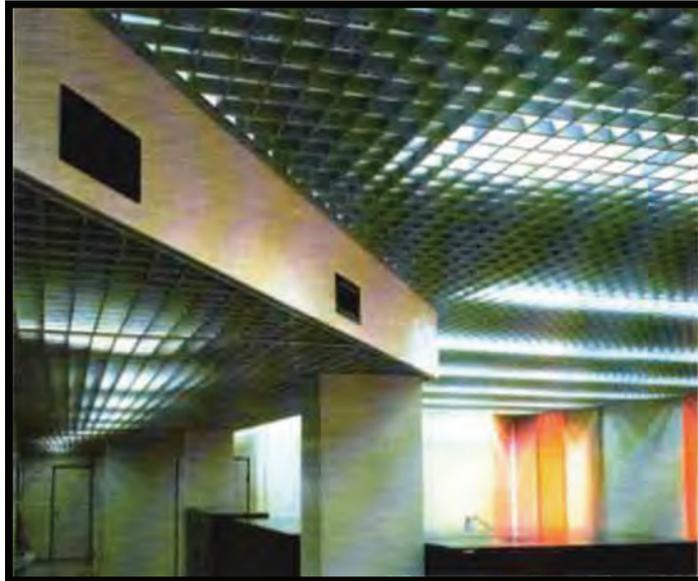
Discontinuous bar-type grating ceilings.
